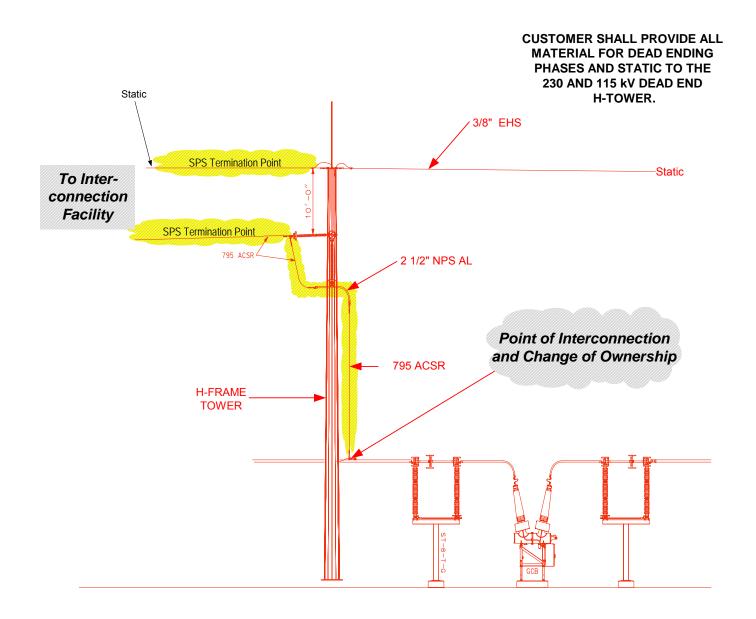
Hobbs Plant Generating Facility Plan Partial View
